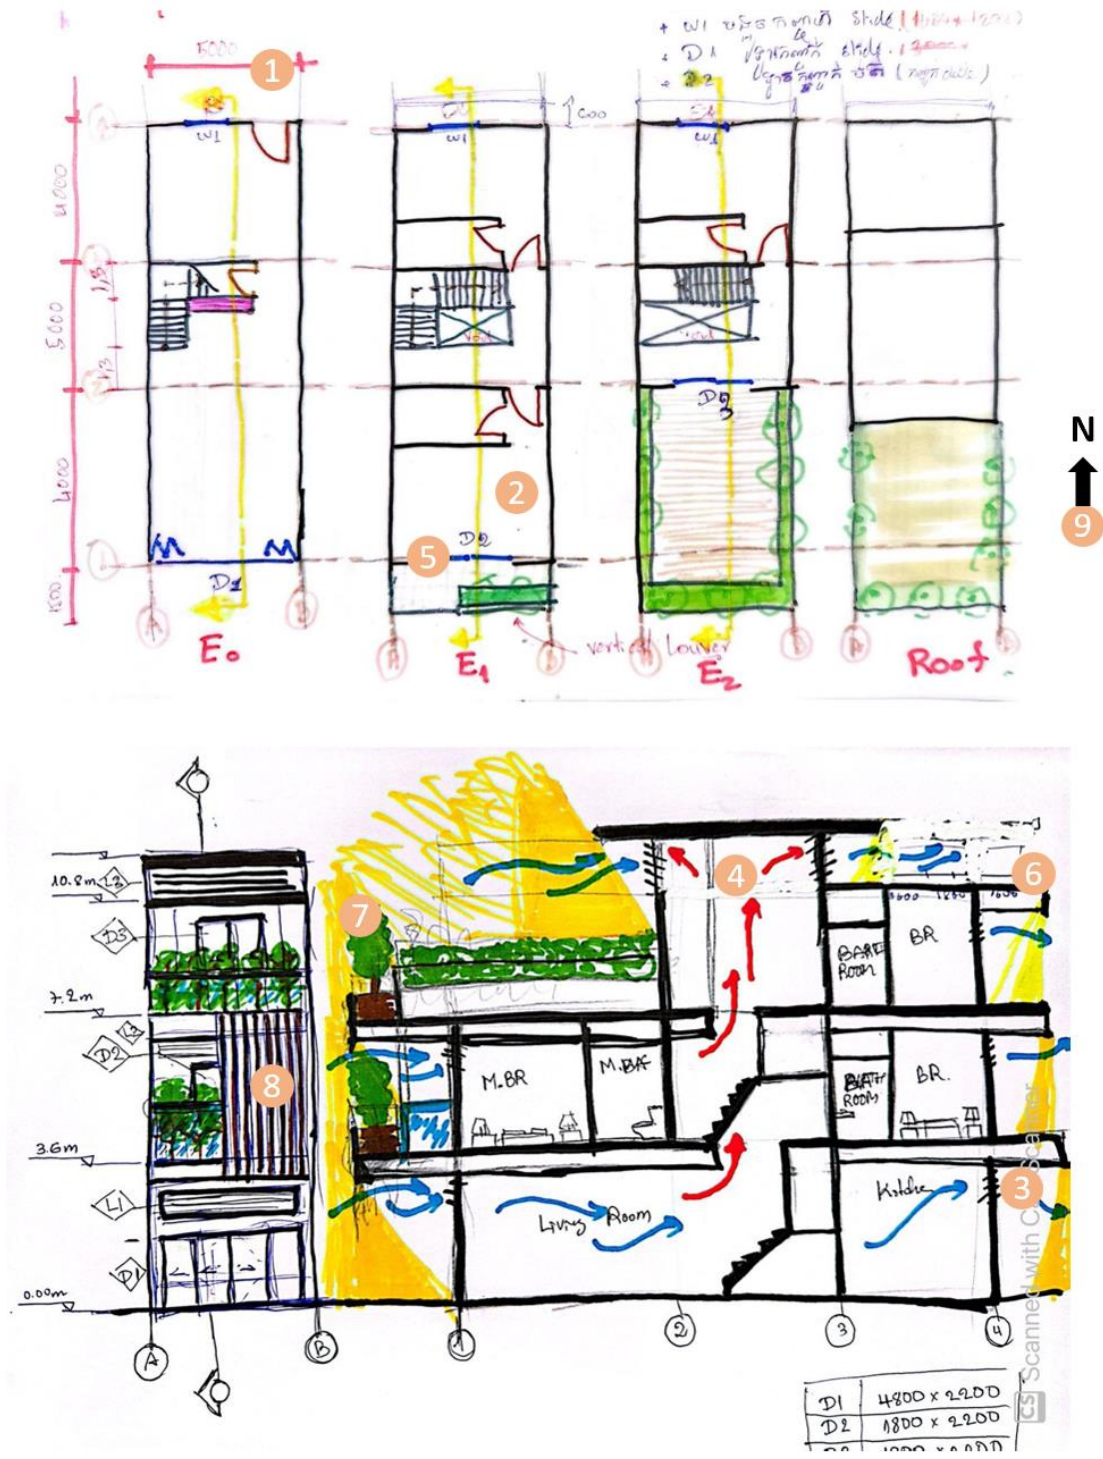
The floor plan and section of bioclimatic design for link house scenarios 01.
